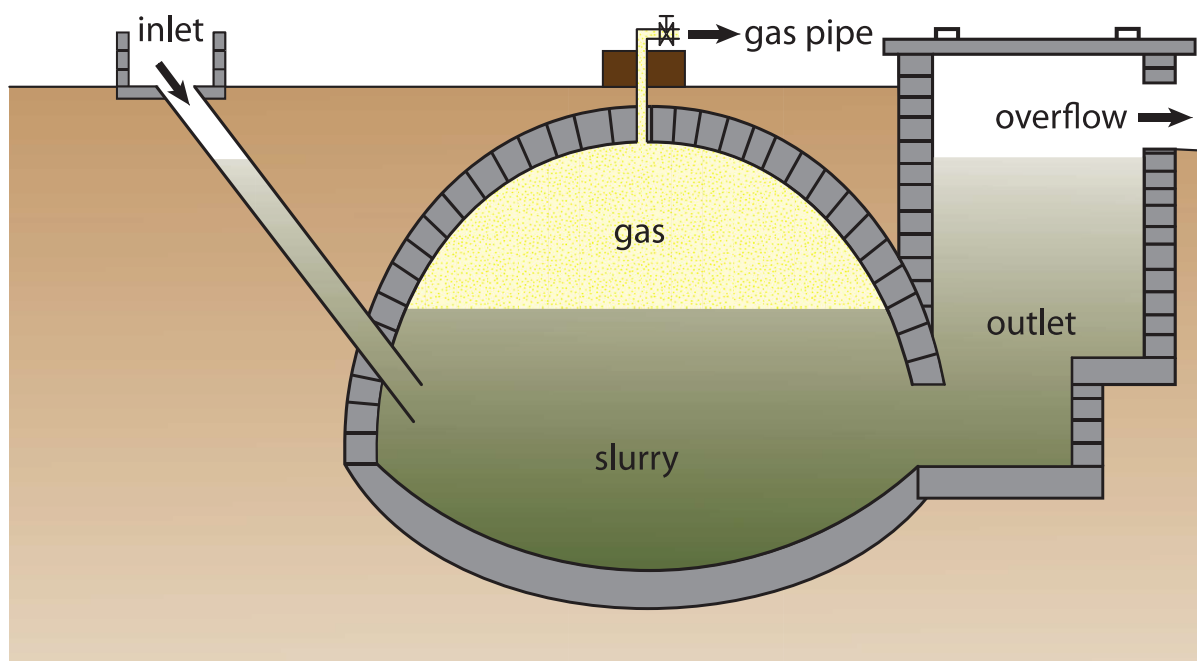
Fixed-dome plant (source: Vögeli, 2014)
